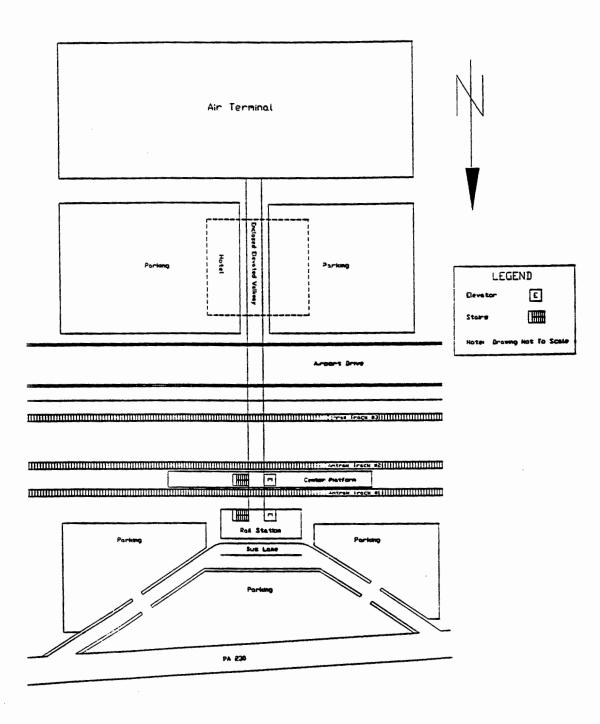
A: Center Platform with Overhead Walkway- Plan View
